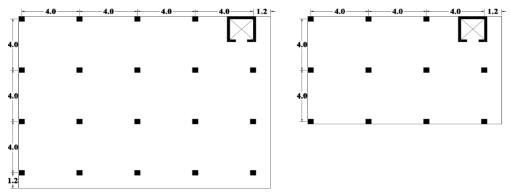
Showing Floor Grouping - Ground Floor Plan (Left Side) and First to Fourth Floor Plans (Right Side)
